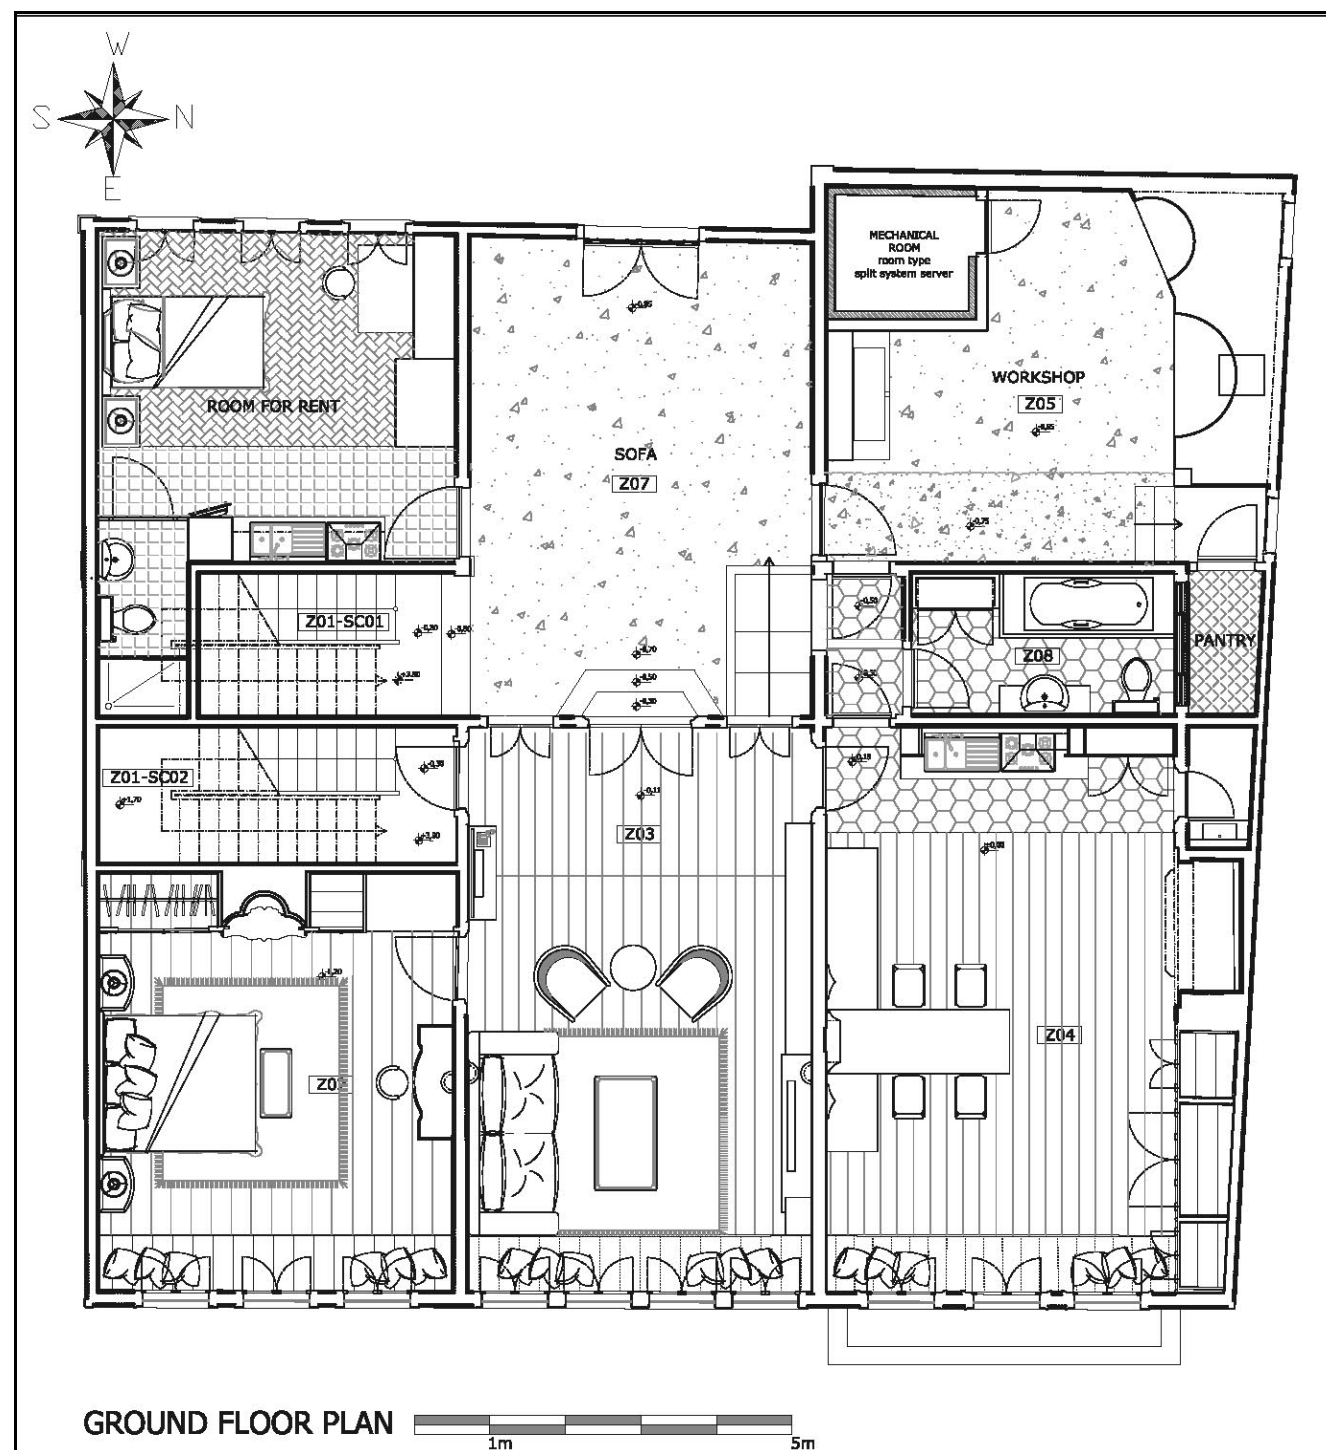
Restoration Project – Ground Floor Plan: 1/100 (Presented in 1/50 at Jury)
